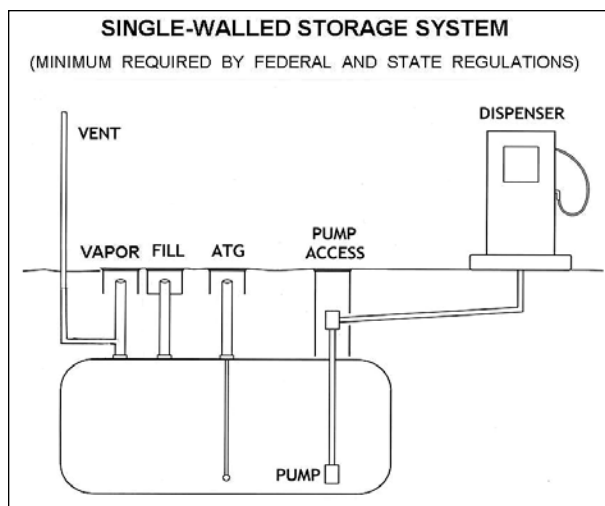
Schematic diagram of the typical components of a single-walled underground storage system.
